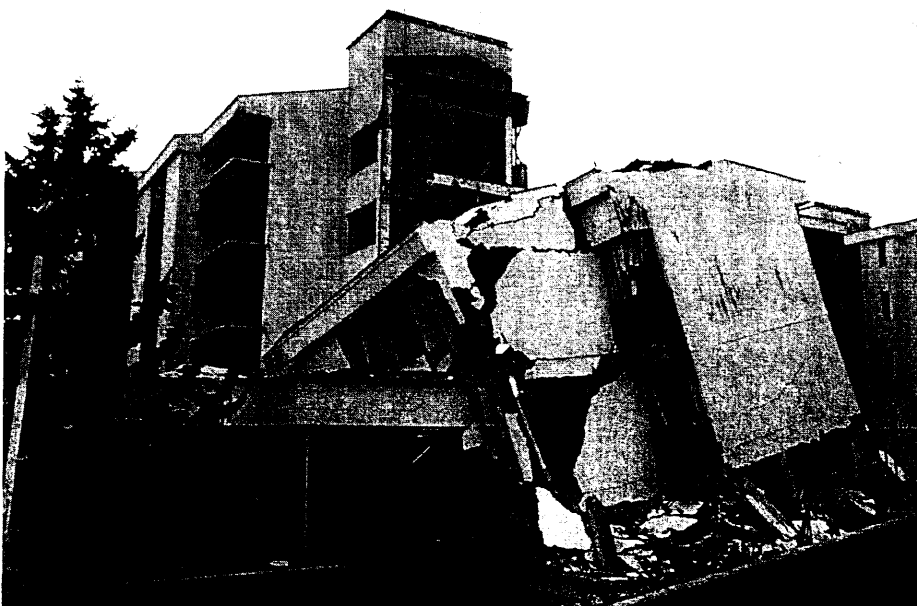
Typical collapse of a concrete framed building in Armenia due to poor detailing
